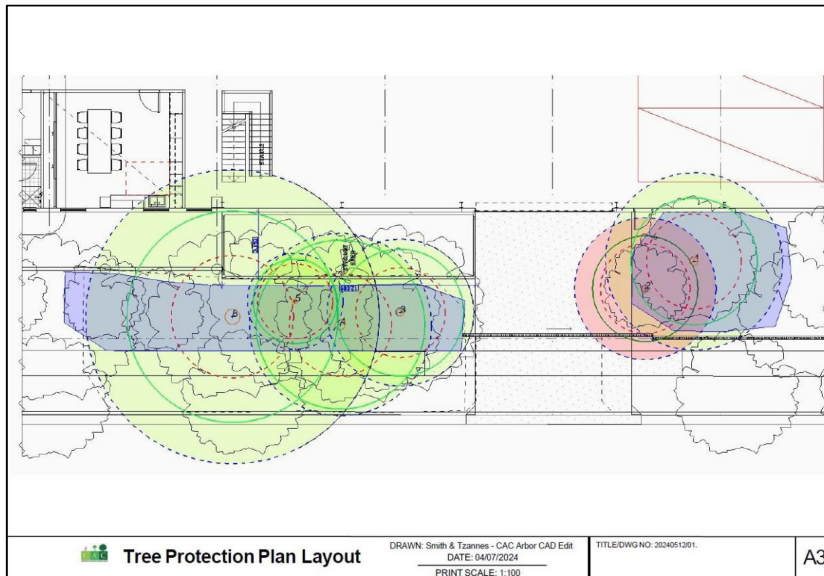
Tree Protection Layout Diagram (Source: Concept Arbor Consulting 2024)
